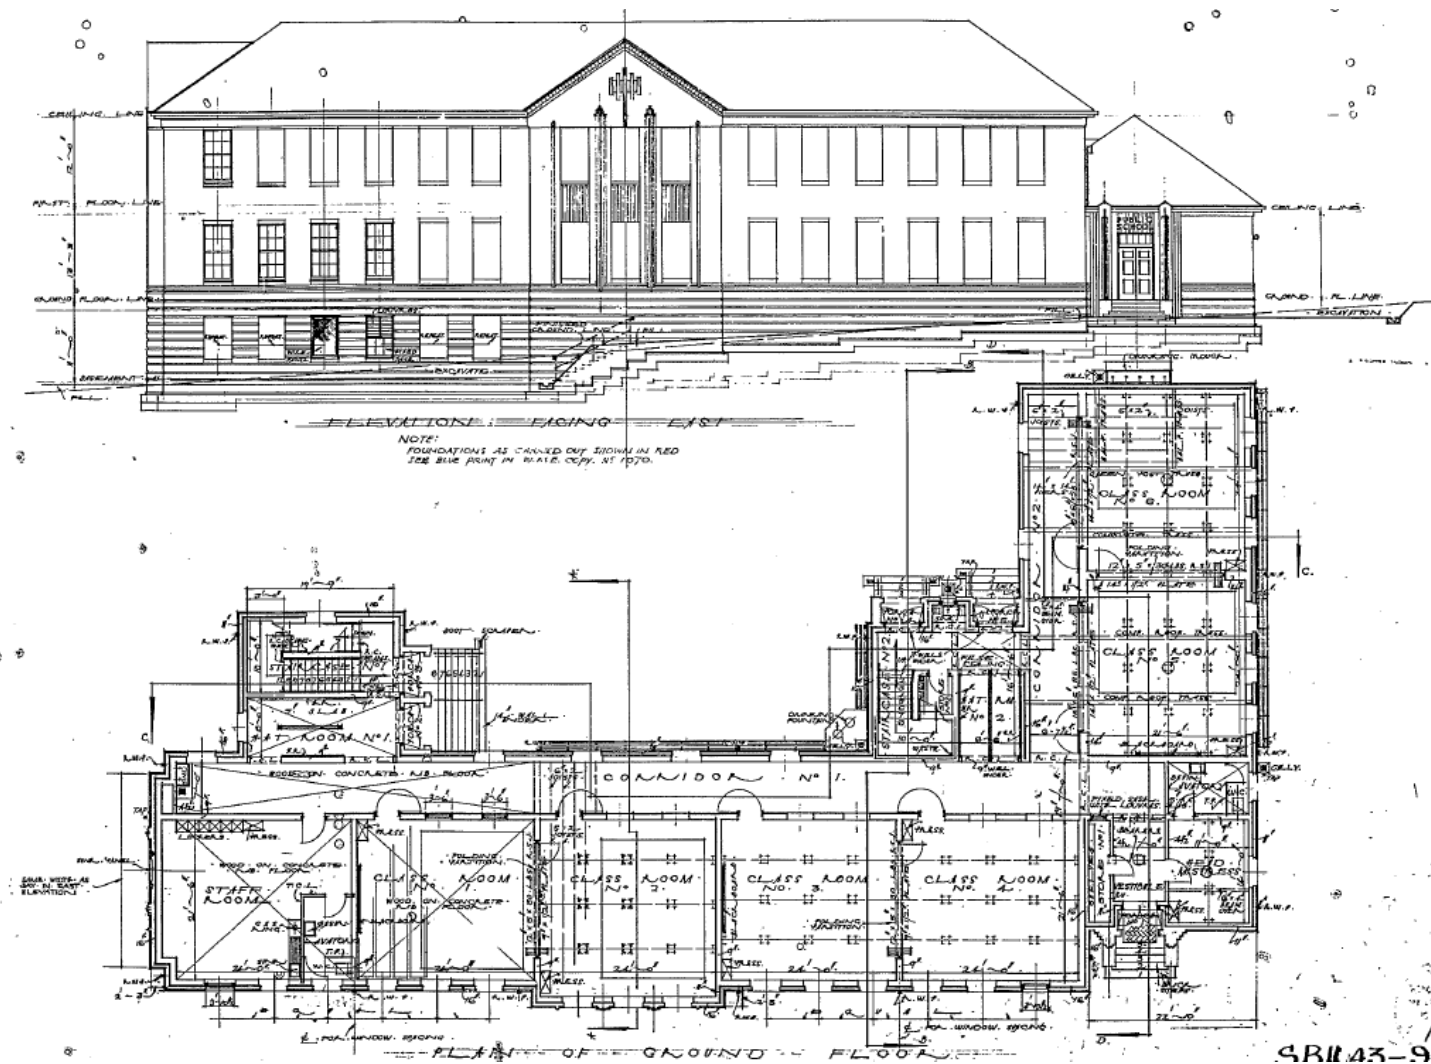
1934 East Elevation and Ground Floor Plan of the Girls building (Pacific Building).
